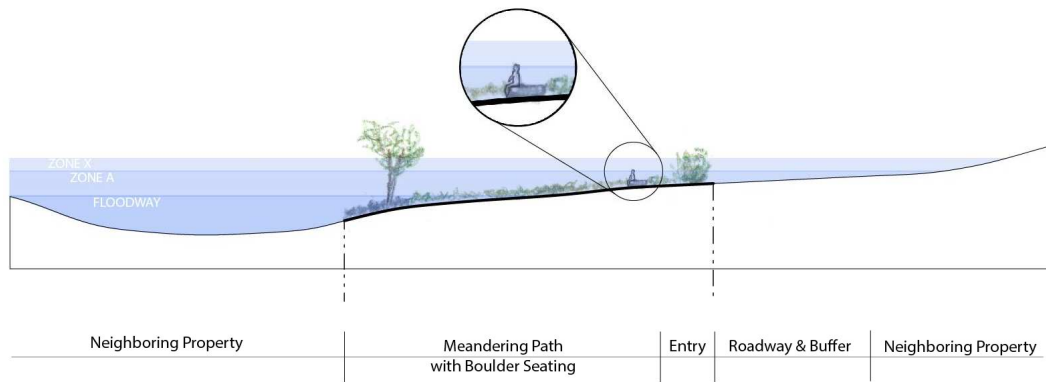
Section of 518 High Falls Road Extension showing scaling and relationships between site amenities and floodwaters.
